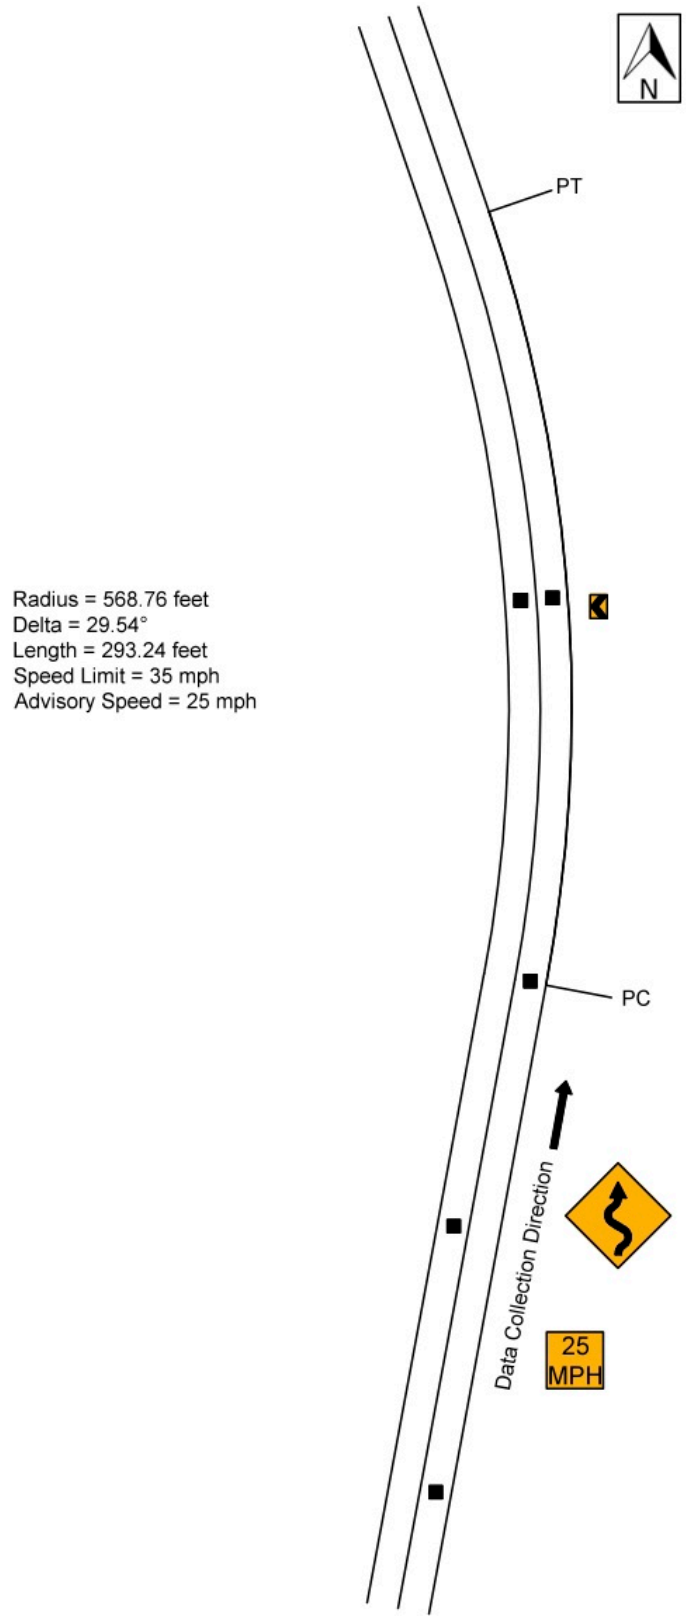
Diagram. Geometric layout of northbound Tucker Road (not to scale).
